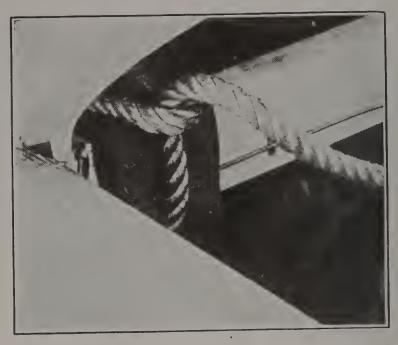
TYPE OF SLIPKNOT USED TO SECURE LIFTING ROPES TO SIDEWALK BEAMS. NOTE PADDING UNDER ROPE TO PROTECT BEAM FROM CUTTING.
